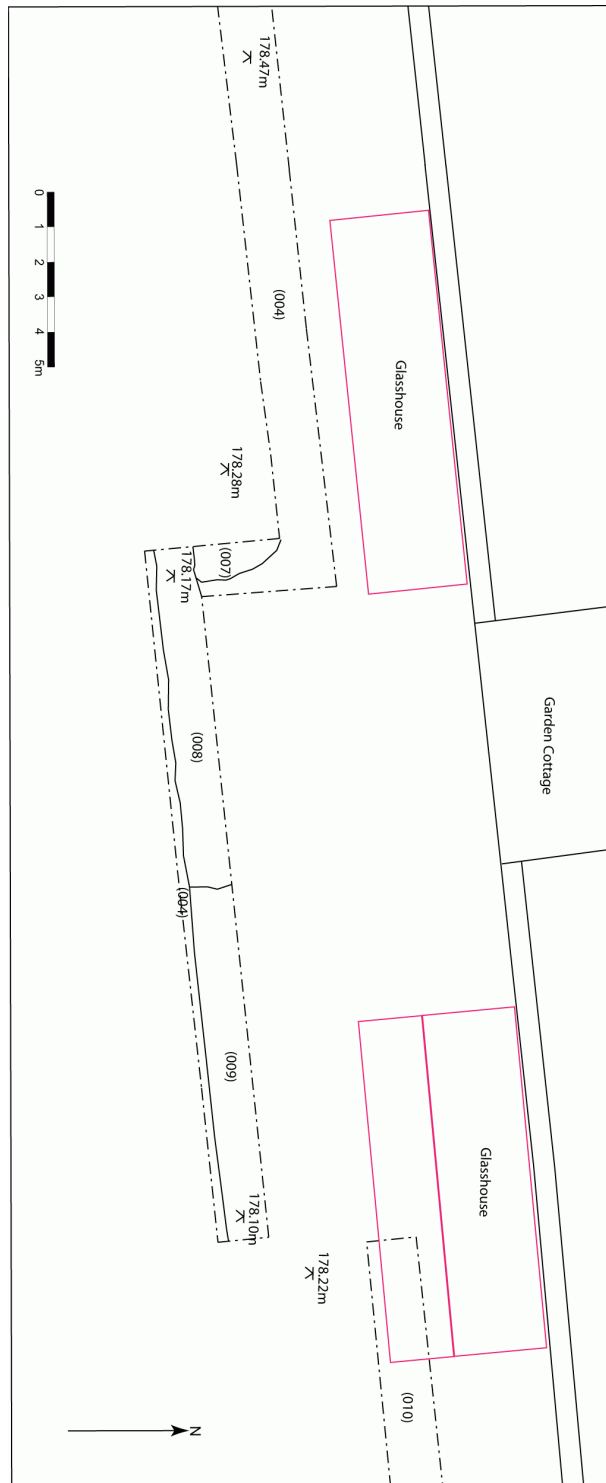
Plan showing location of glasshouses (as shown on the 1st Edition 1891 OS) and 2013 trench locations (detail)
